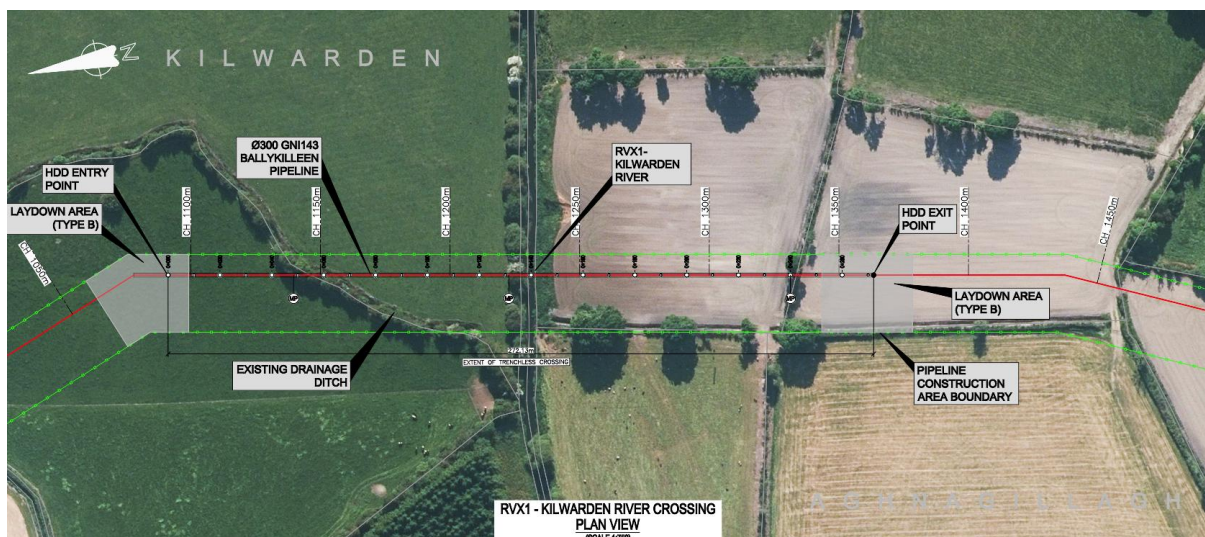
Plan View of the proposed HDD Crossing and Pipe String Corridor at the Kilwarden River (refer to drg. no. GNI143-GNI-PL-CRI-0001-01).
